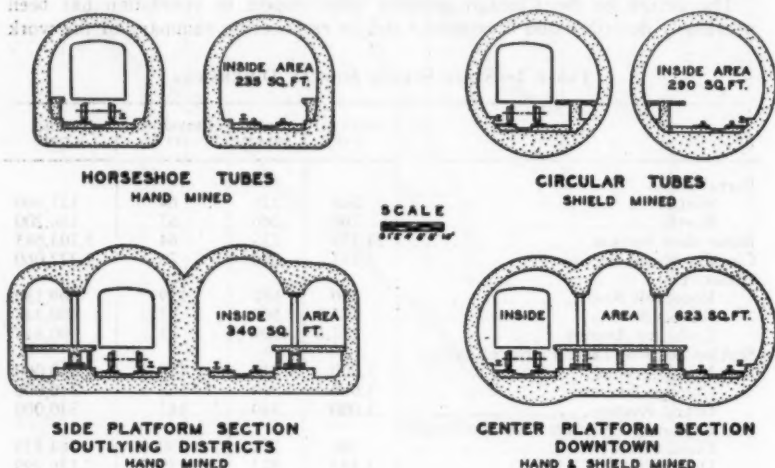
TYPICAL SECTIONS OF STATE STREET SUBWAY
